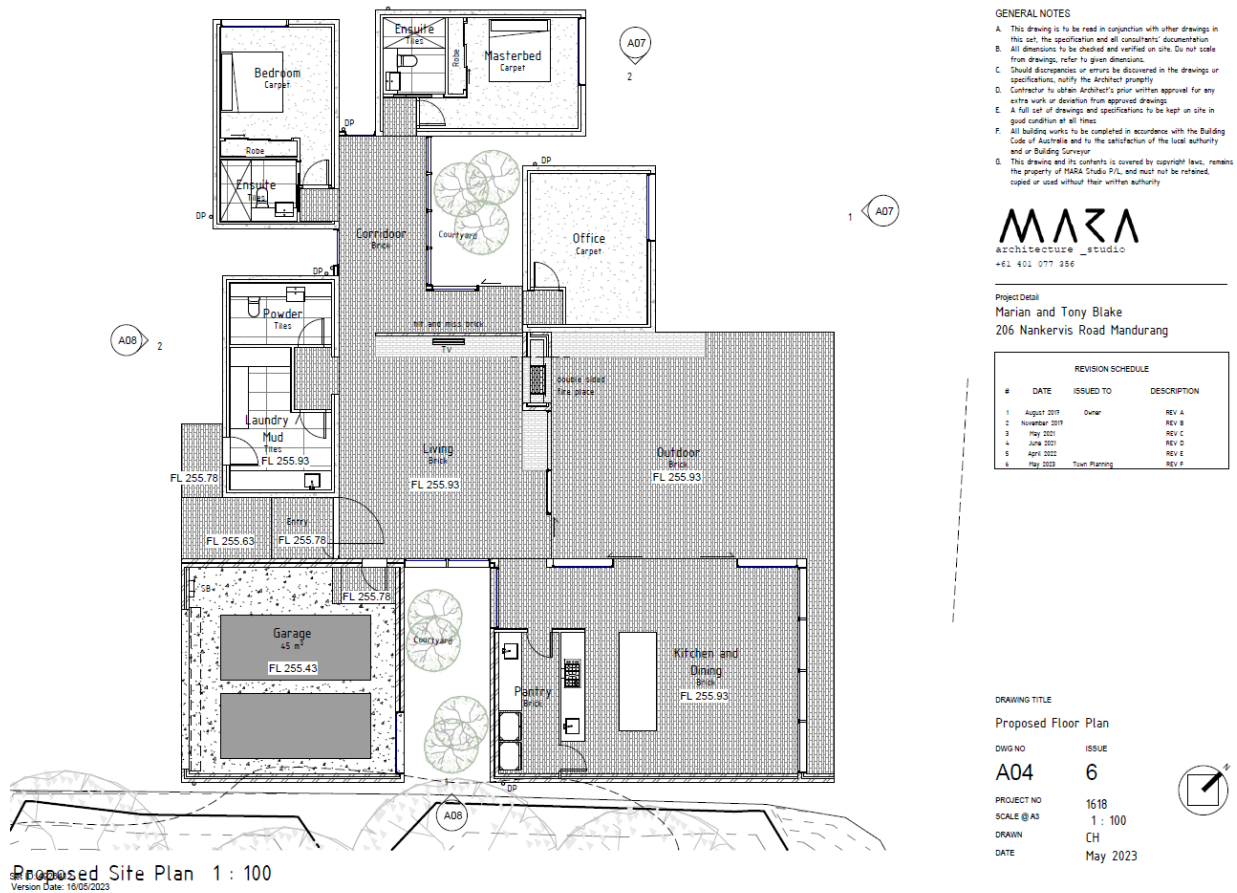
Proposed Floor Plan submitted under AM/43/2018/B
